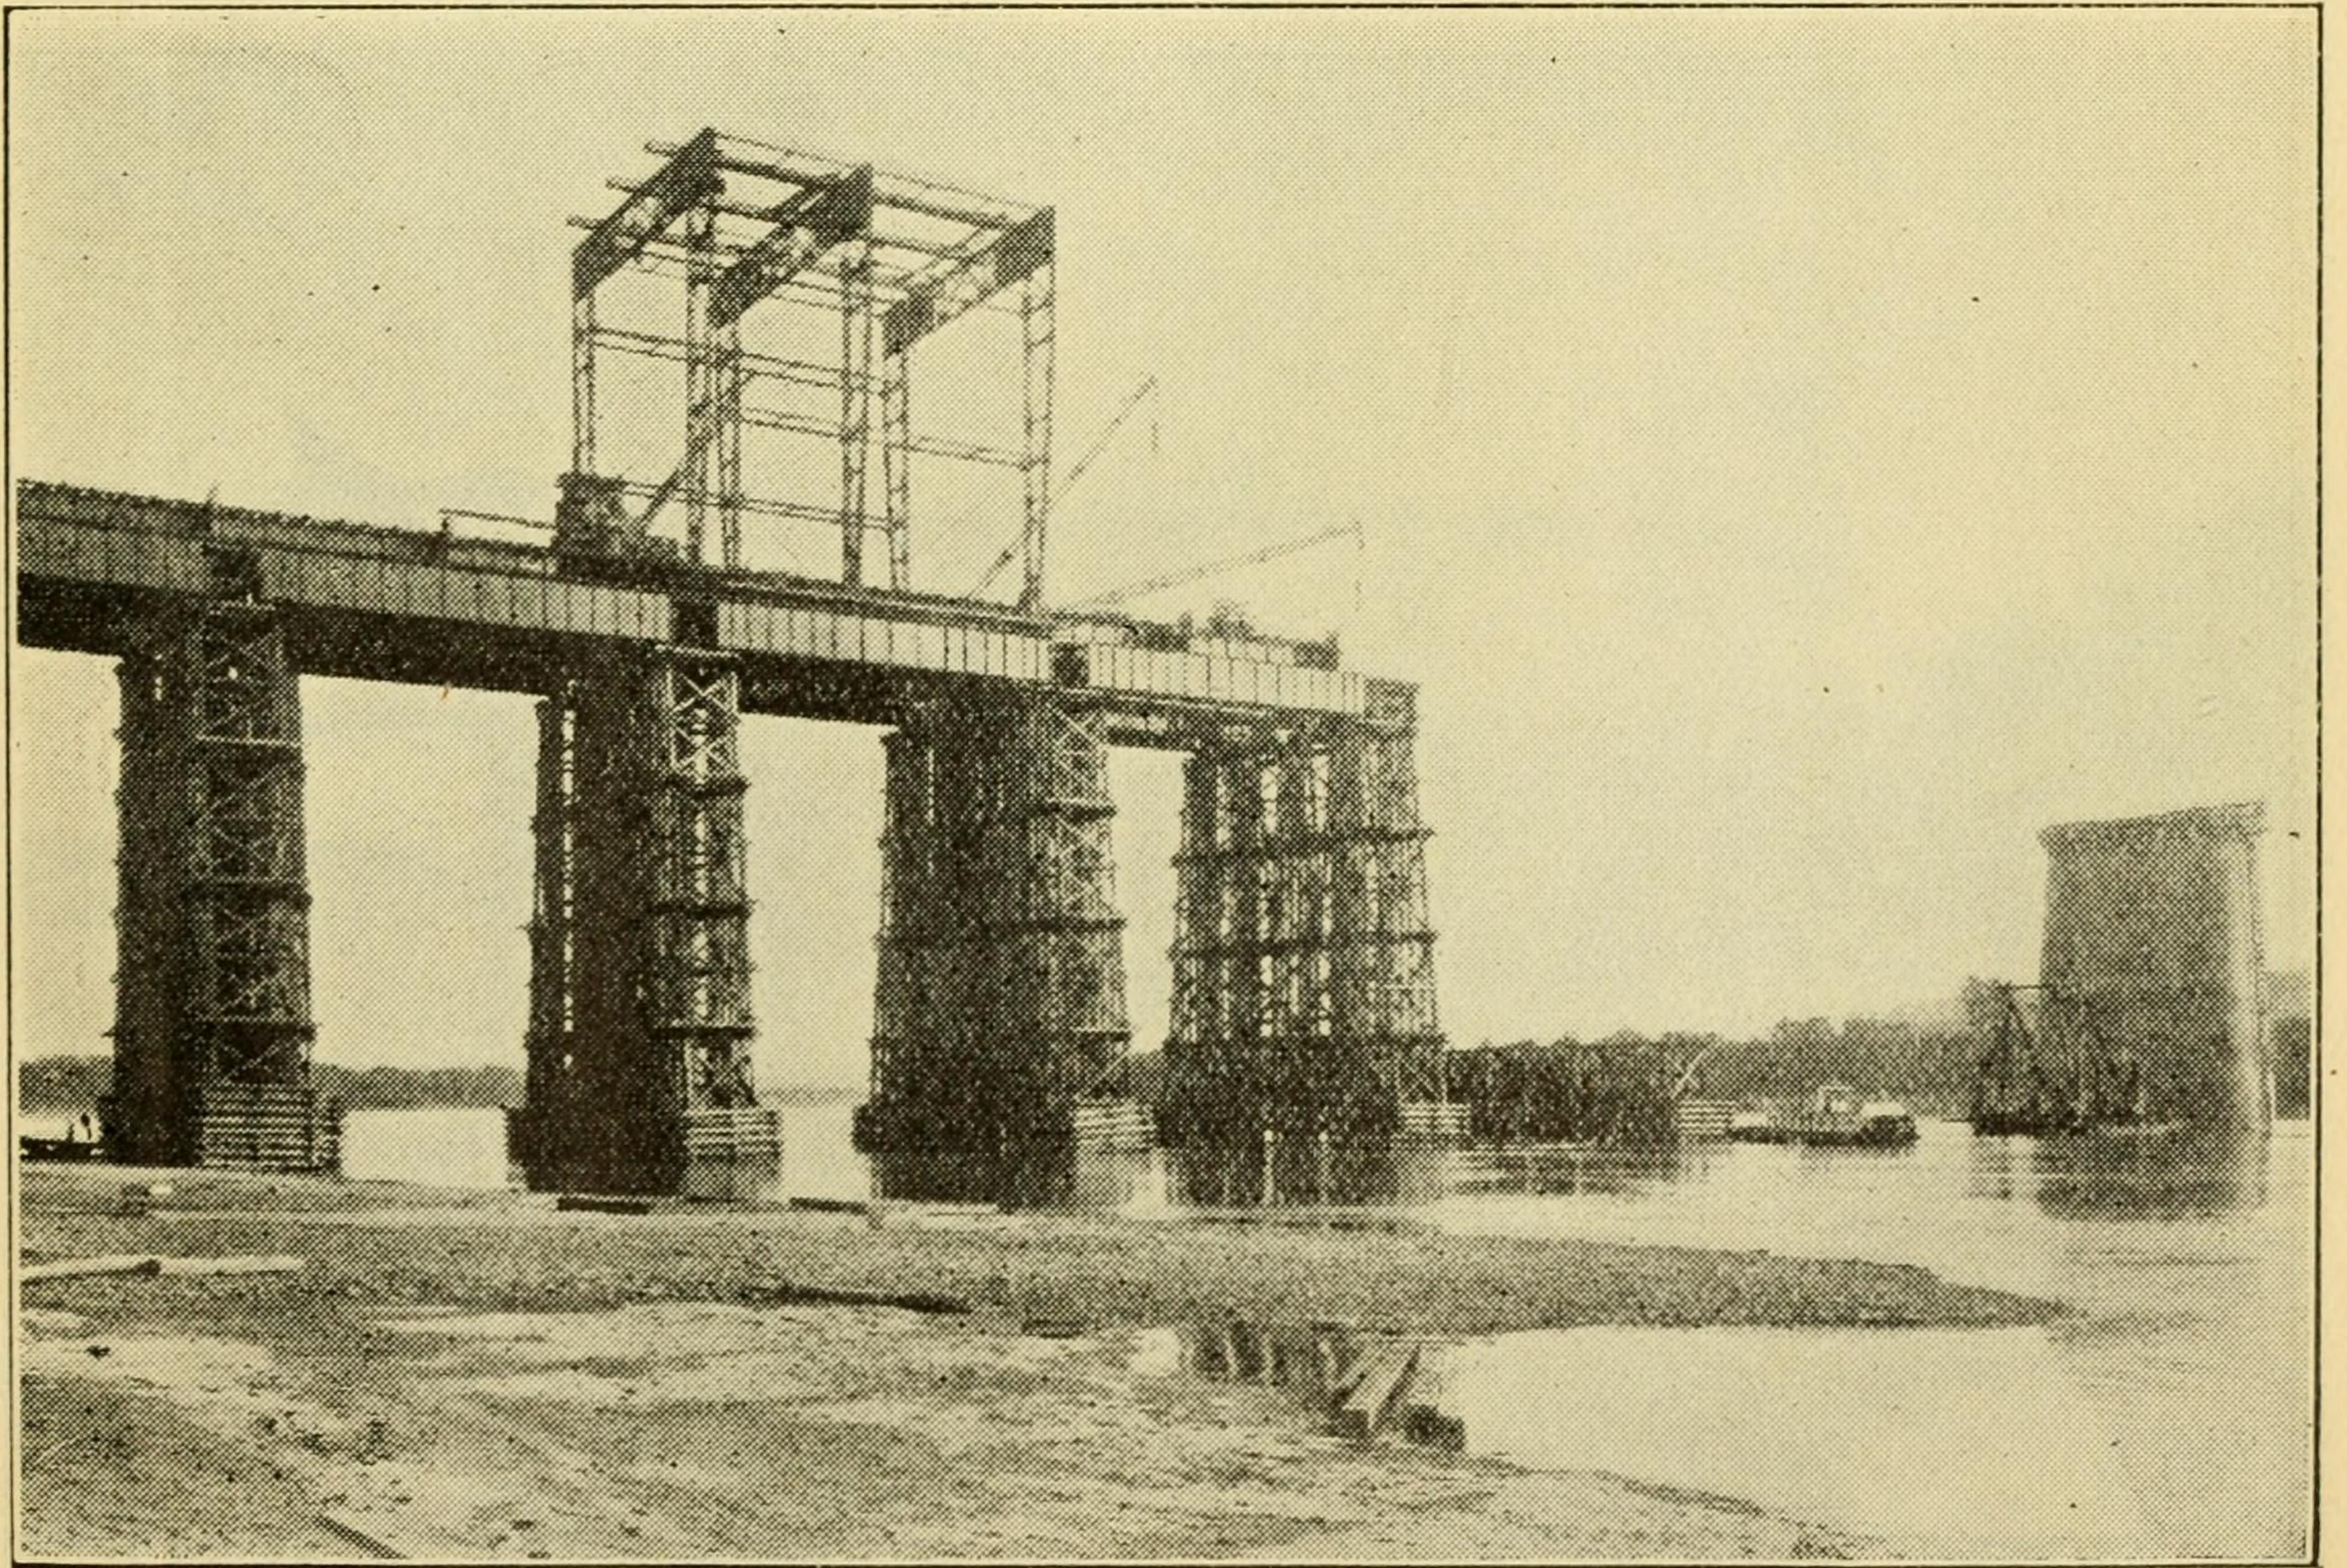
ERECTION OF FALSEWORK AND LAYING OF STEEL FLOOR SYSTEM AND TRACKS BY GANTRY TRAVELER, SCIOTOVILLE BRIDGE.
